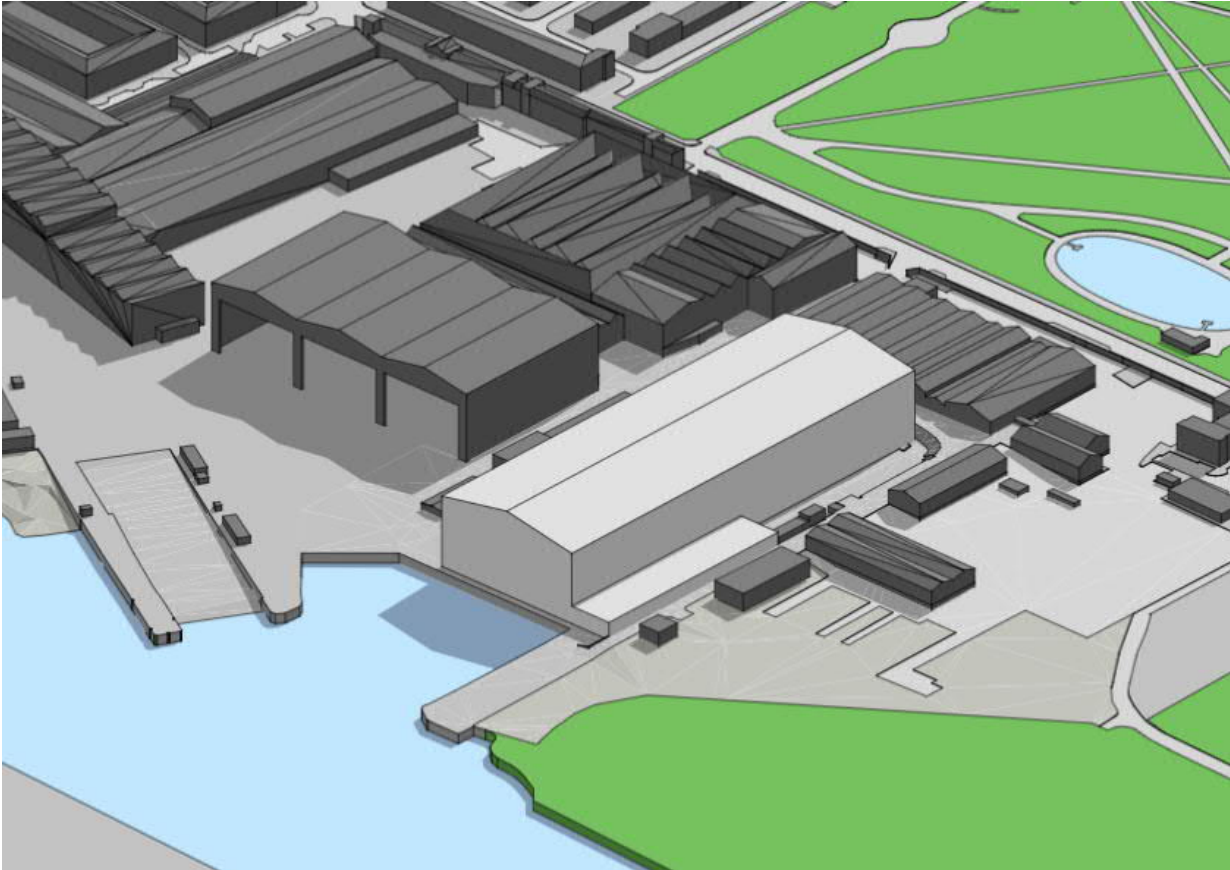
Proposed site development concept, infilling of wet basin and construction of Ship Assembly Hall building.
